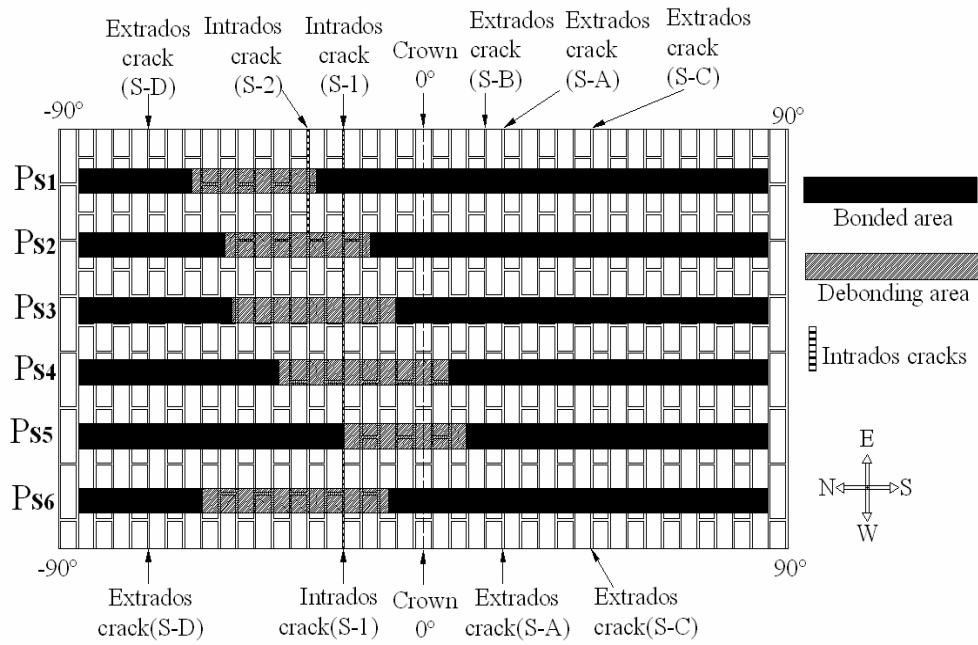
Plan view along the developed length of the southern arch after failure, showing the location of cracks and extent of debonding
